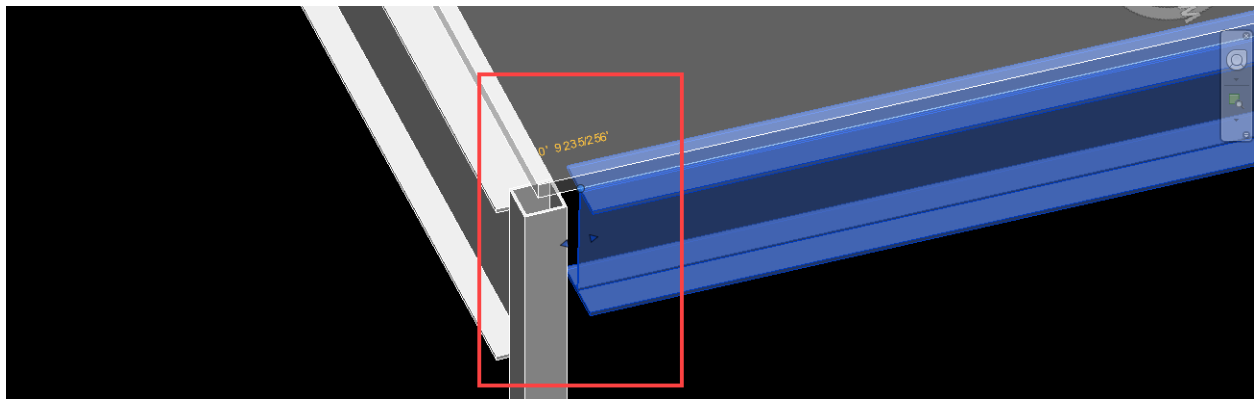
STEEL BEAM NOT JOINED TO COLUMN
